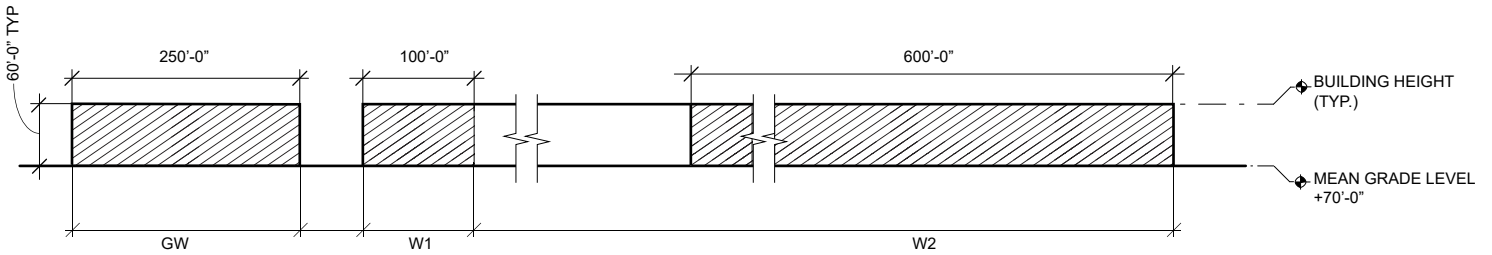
BUILDING SIGNAGE - RETAIL SITE B, NORTH AND SOUTH
